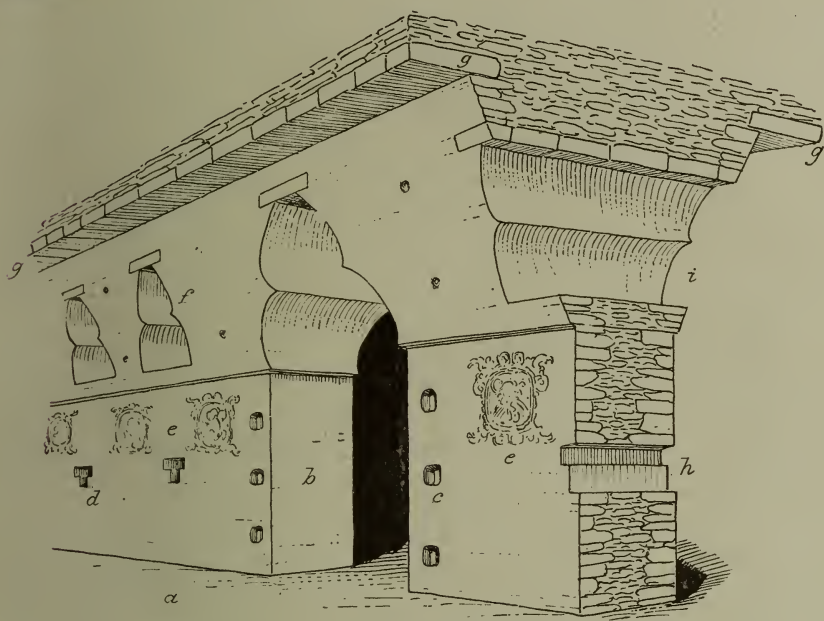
INTERIOR DOORWAY WITH SECTION OF MEDIAL WALL AND CEILING.
